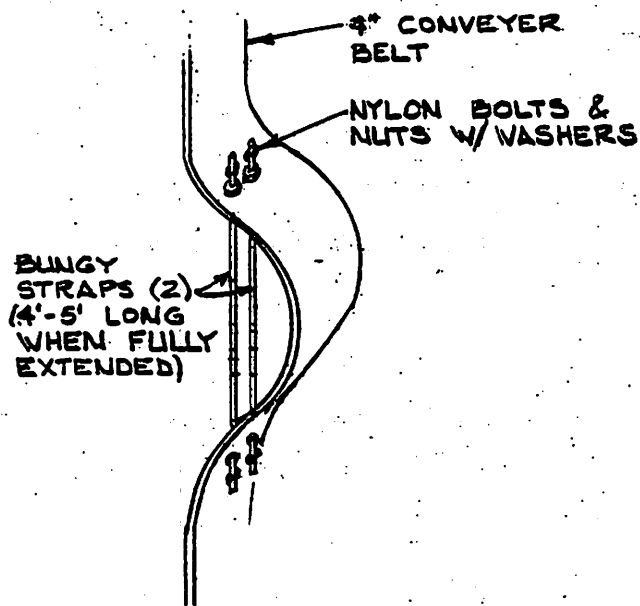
ELEVATION - MOORING DESIGN @ HIGH TIDE
